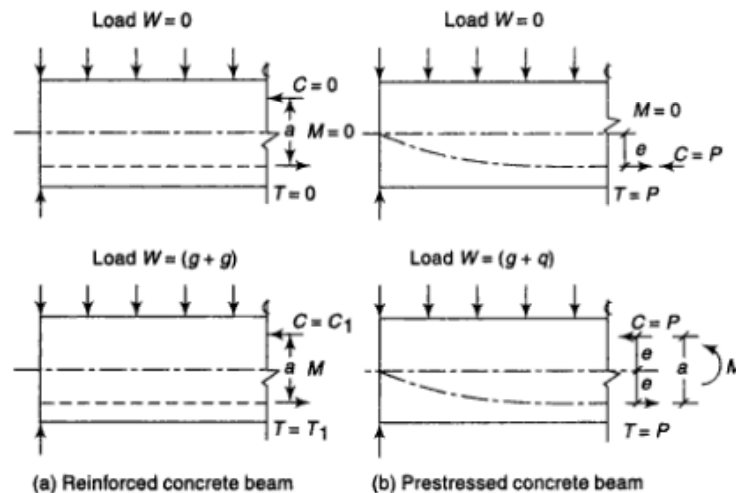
Load carrying mechanism of reinforced concrete and prestressed concrete beam sections[23]
